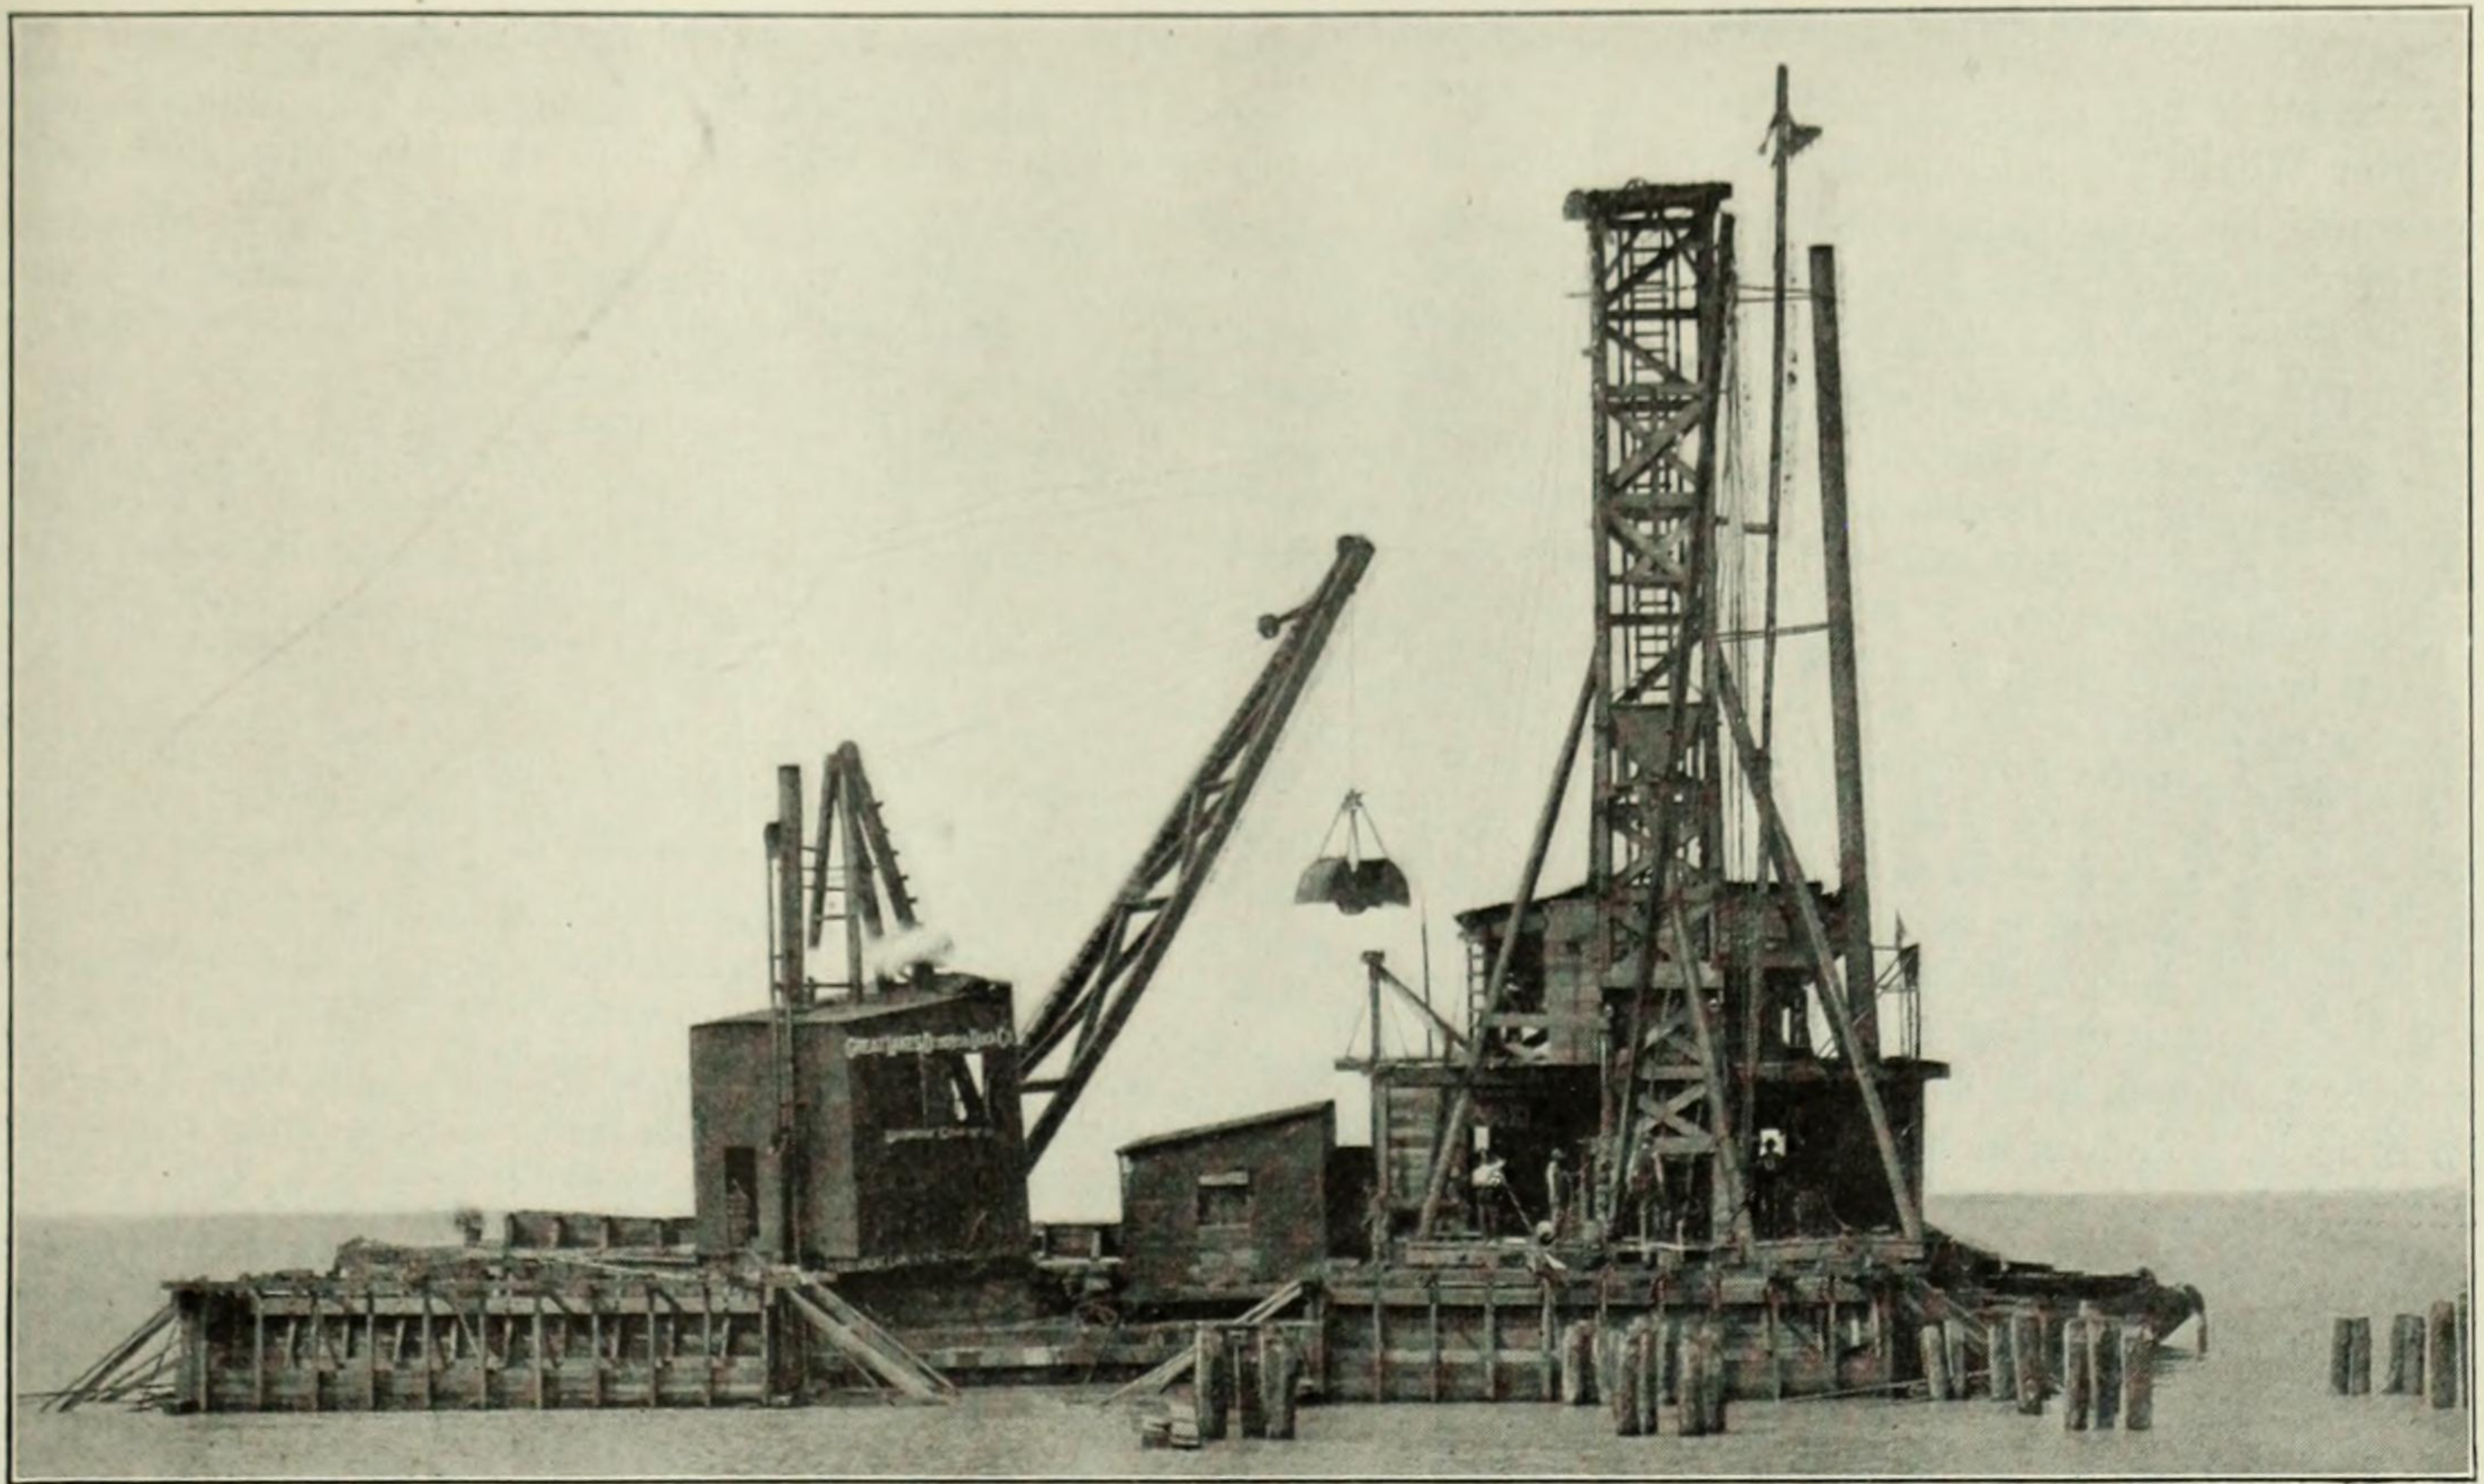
FLOATING CONCRETING PLANT USED FOR THE SUBSTRUCTURE OF THE JACKSON ST. BRIDGE
